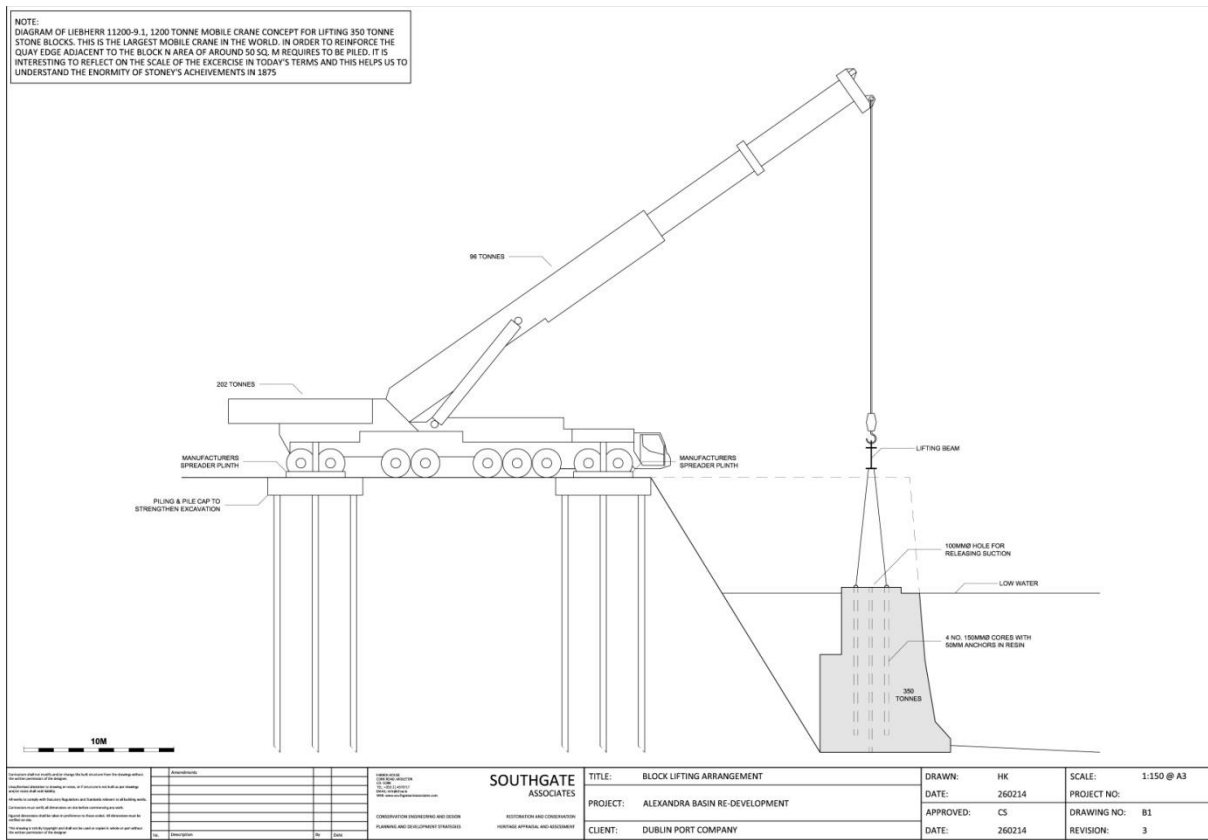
CRANEAGE ARRANGEMENT FOR LIFTING A 350 TON STONEY BLOCK
